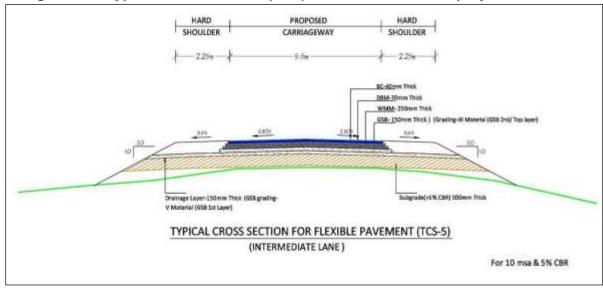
Typical cross sections (TCS) to be followed in the project stretch
